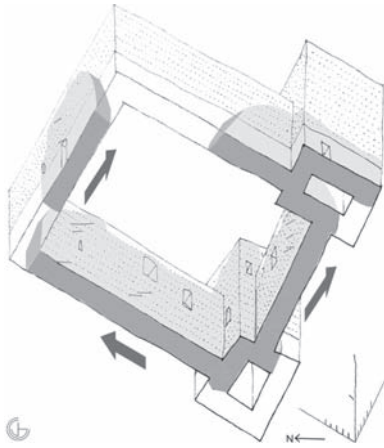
Axonometrical view of the ruins and the hypothetical reconstruction of the rammed earth walls of the castle. Constructive joints—viewed in the ruins—have been designed. The arrows mean the sense of the constructive process. The plan is based in the survey of Lorenzo Celorrio (2003, 347) and in author's data took on site.
